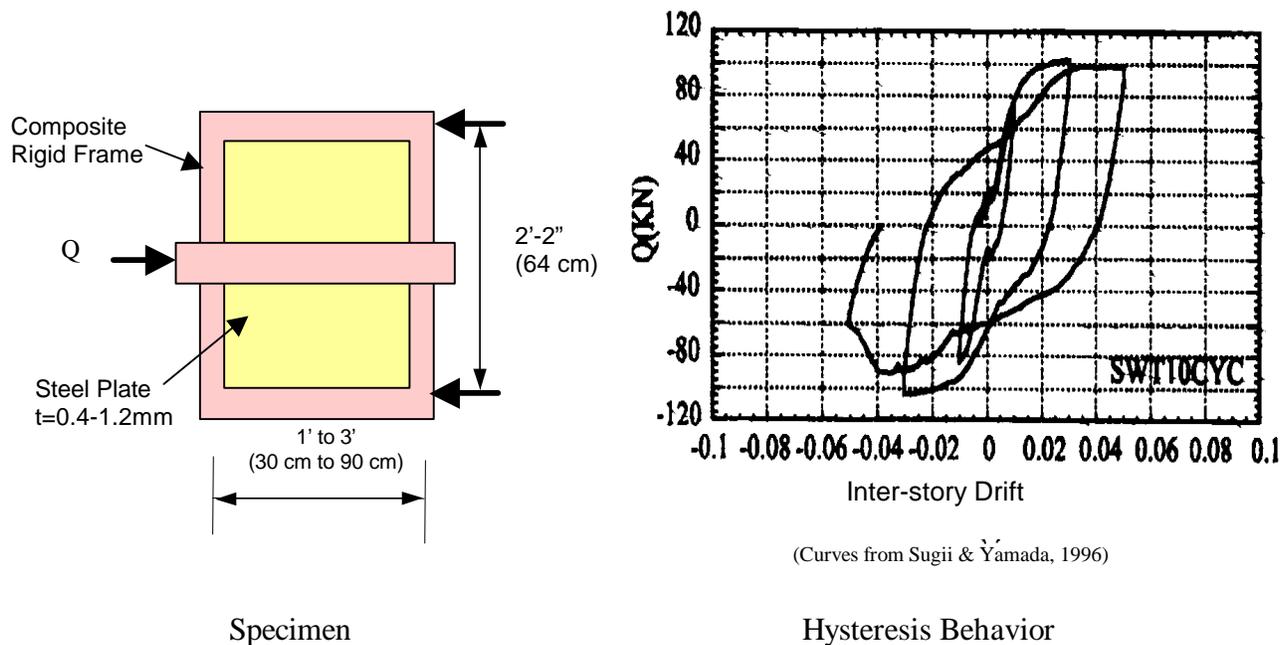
A typical test specimen and typical hysteresis loops for 1 mm plate
